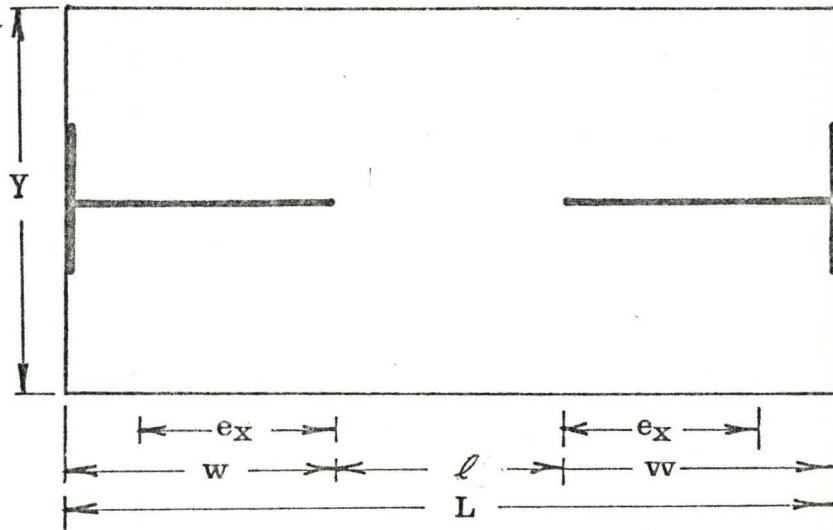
Slab Coupled T-Section Wall Configurations with Flanges at the Outside Edges.
